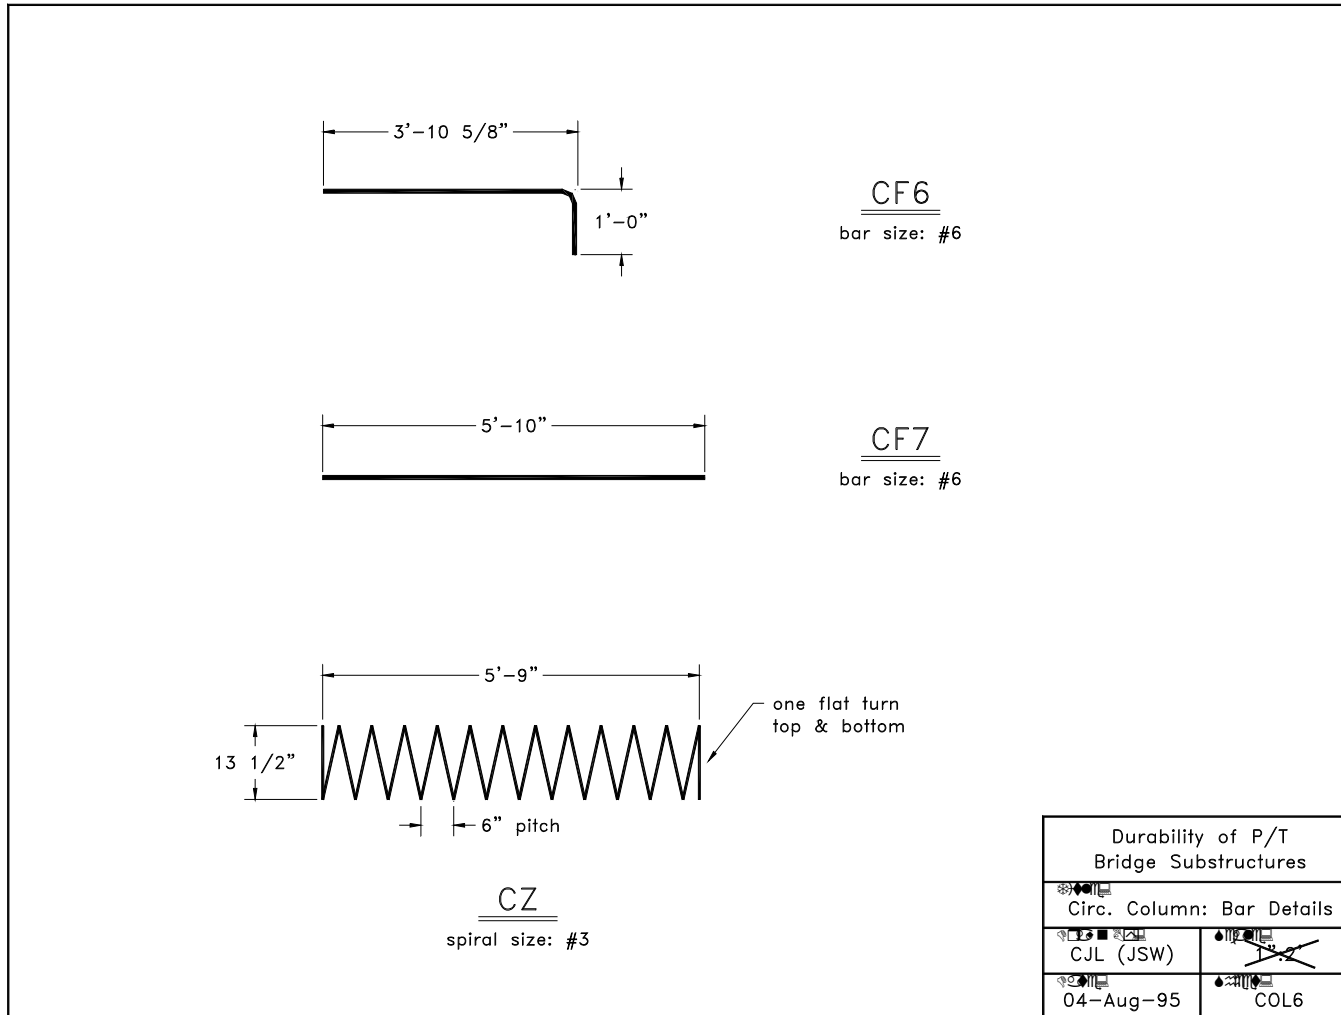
Sheet COL6: Column Reinforcing Bar Details
